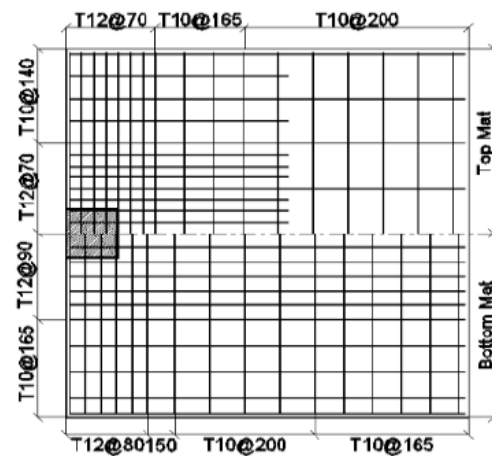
Layout of slab reinforcement for specimen SRR4.
